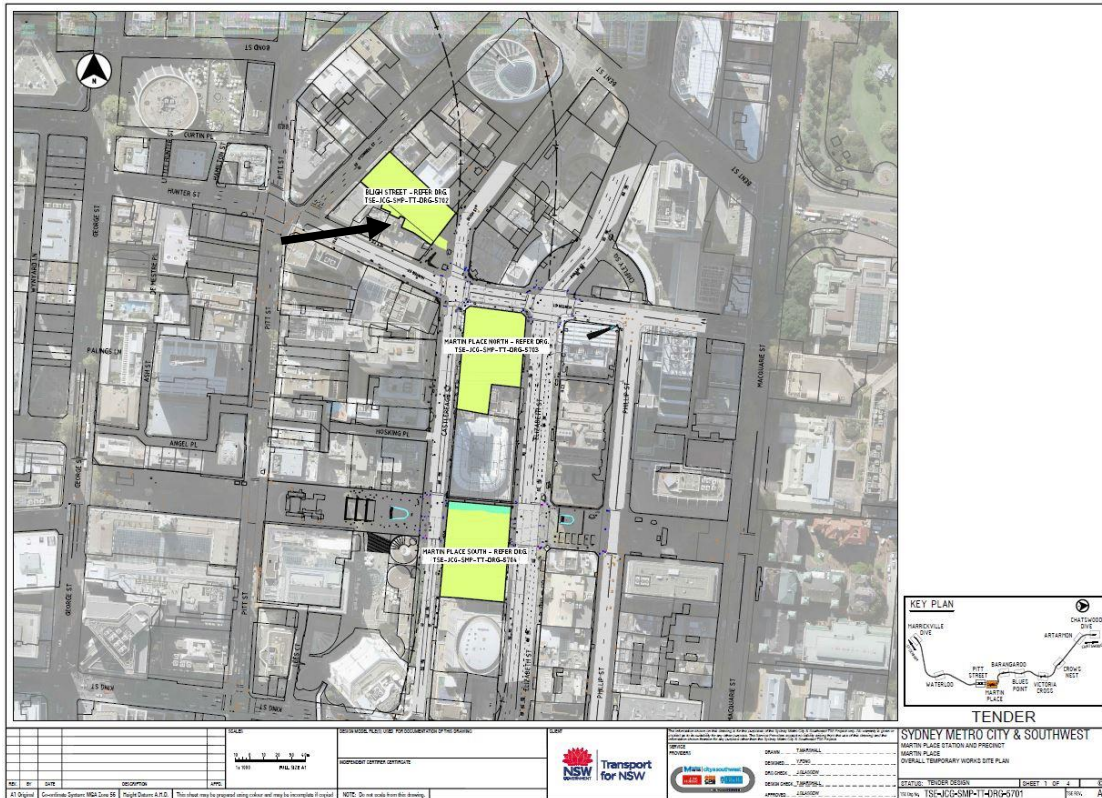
Martin Place Station: Overall Temporary Works Site Plan. The 33 Bligh Street site is arrowed.
